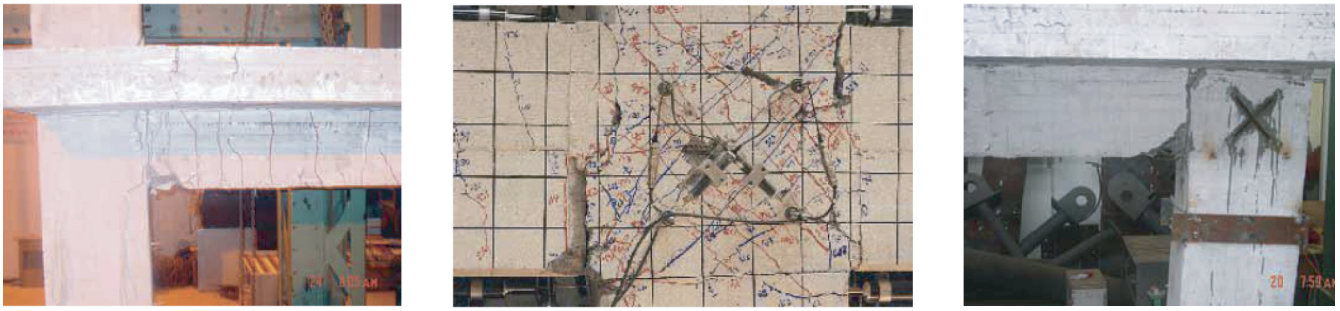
Typical crack pattern of the precast NAC frame (Alcocer *et al.* 2002; Xue and Yang 2010)
